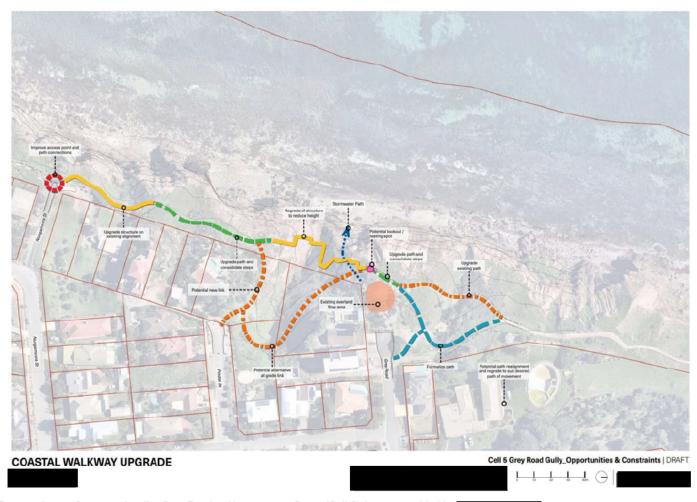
Proposed route for coastal walk - Grey Road to Nungamoora Street (Cell 5). Image provided by
